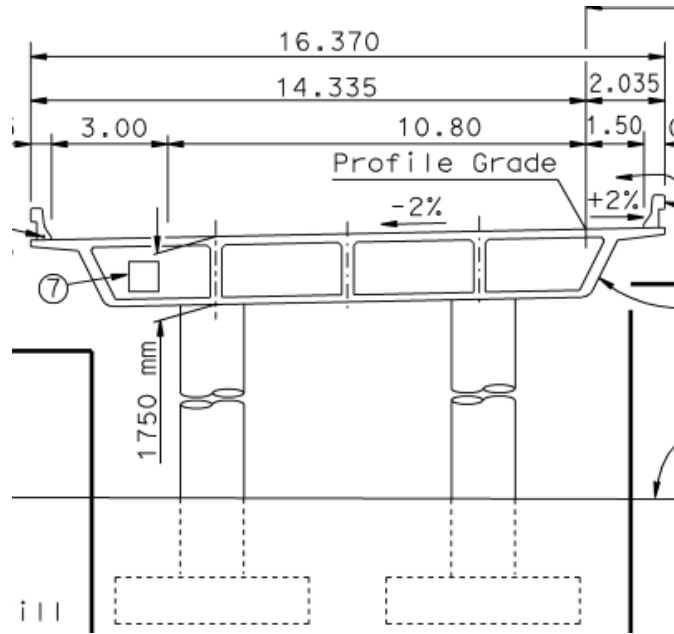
Cross-Section detail of R14L bridge deck (Caltrans)
